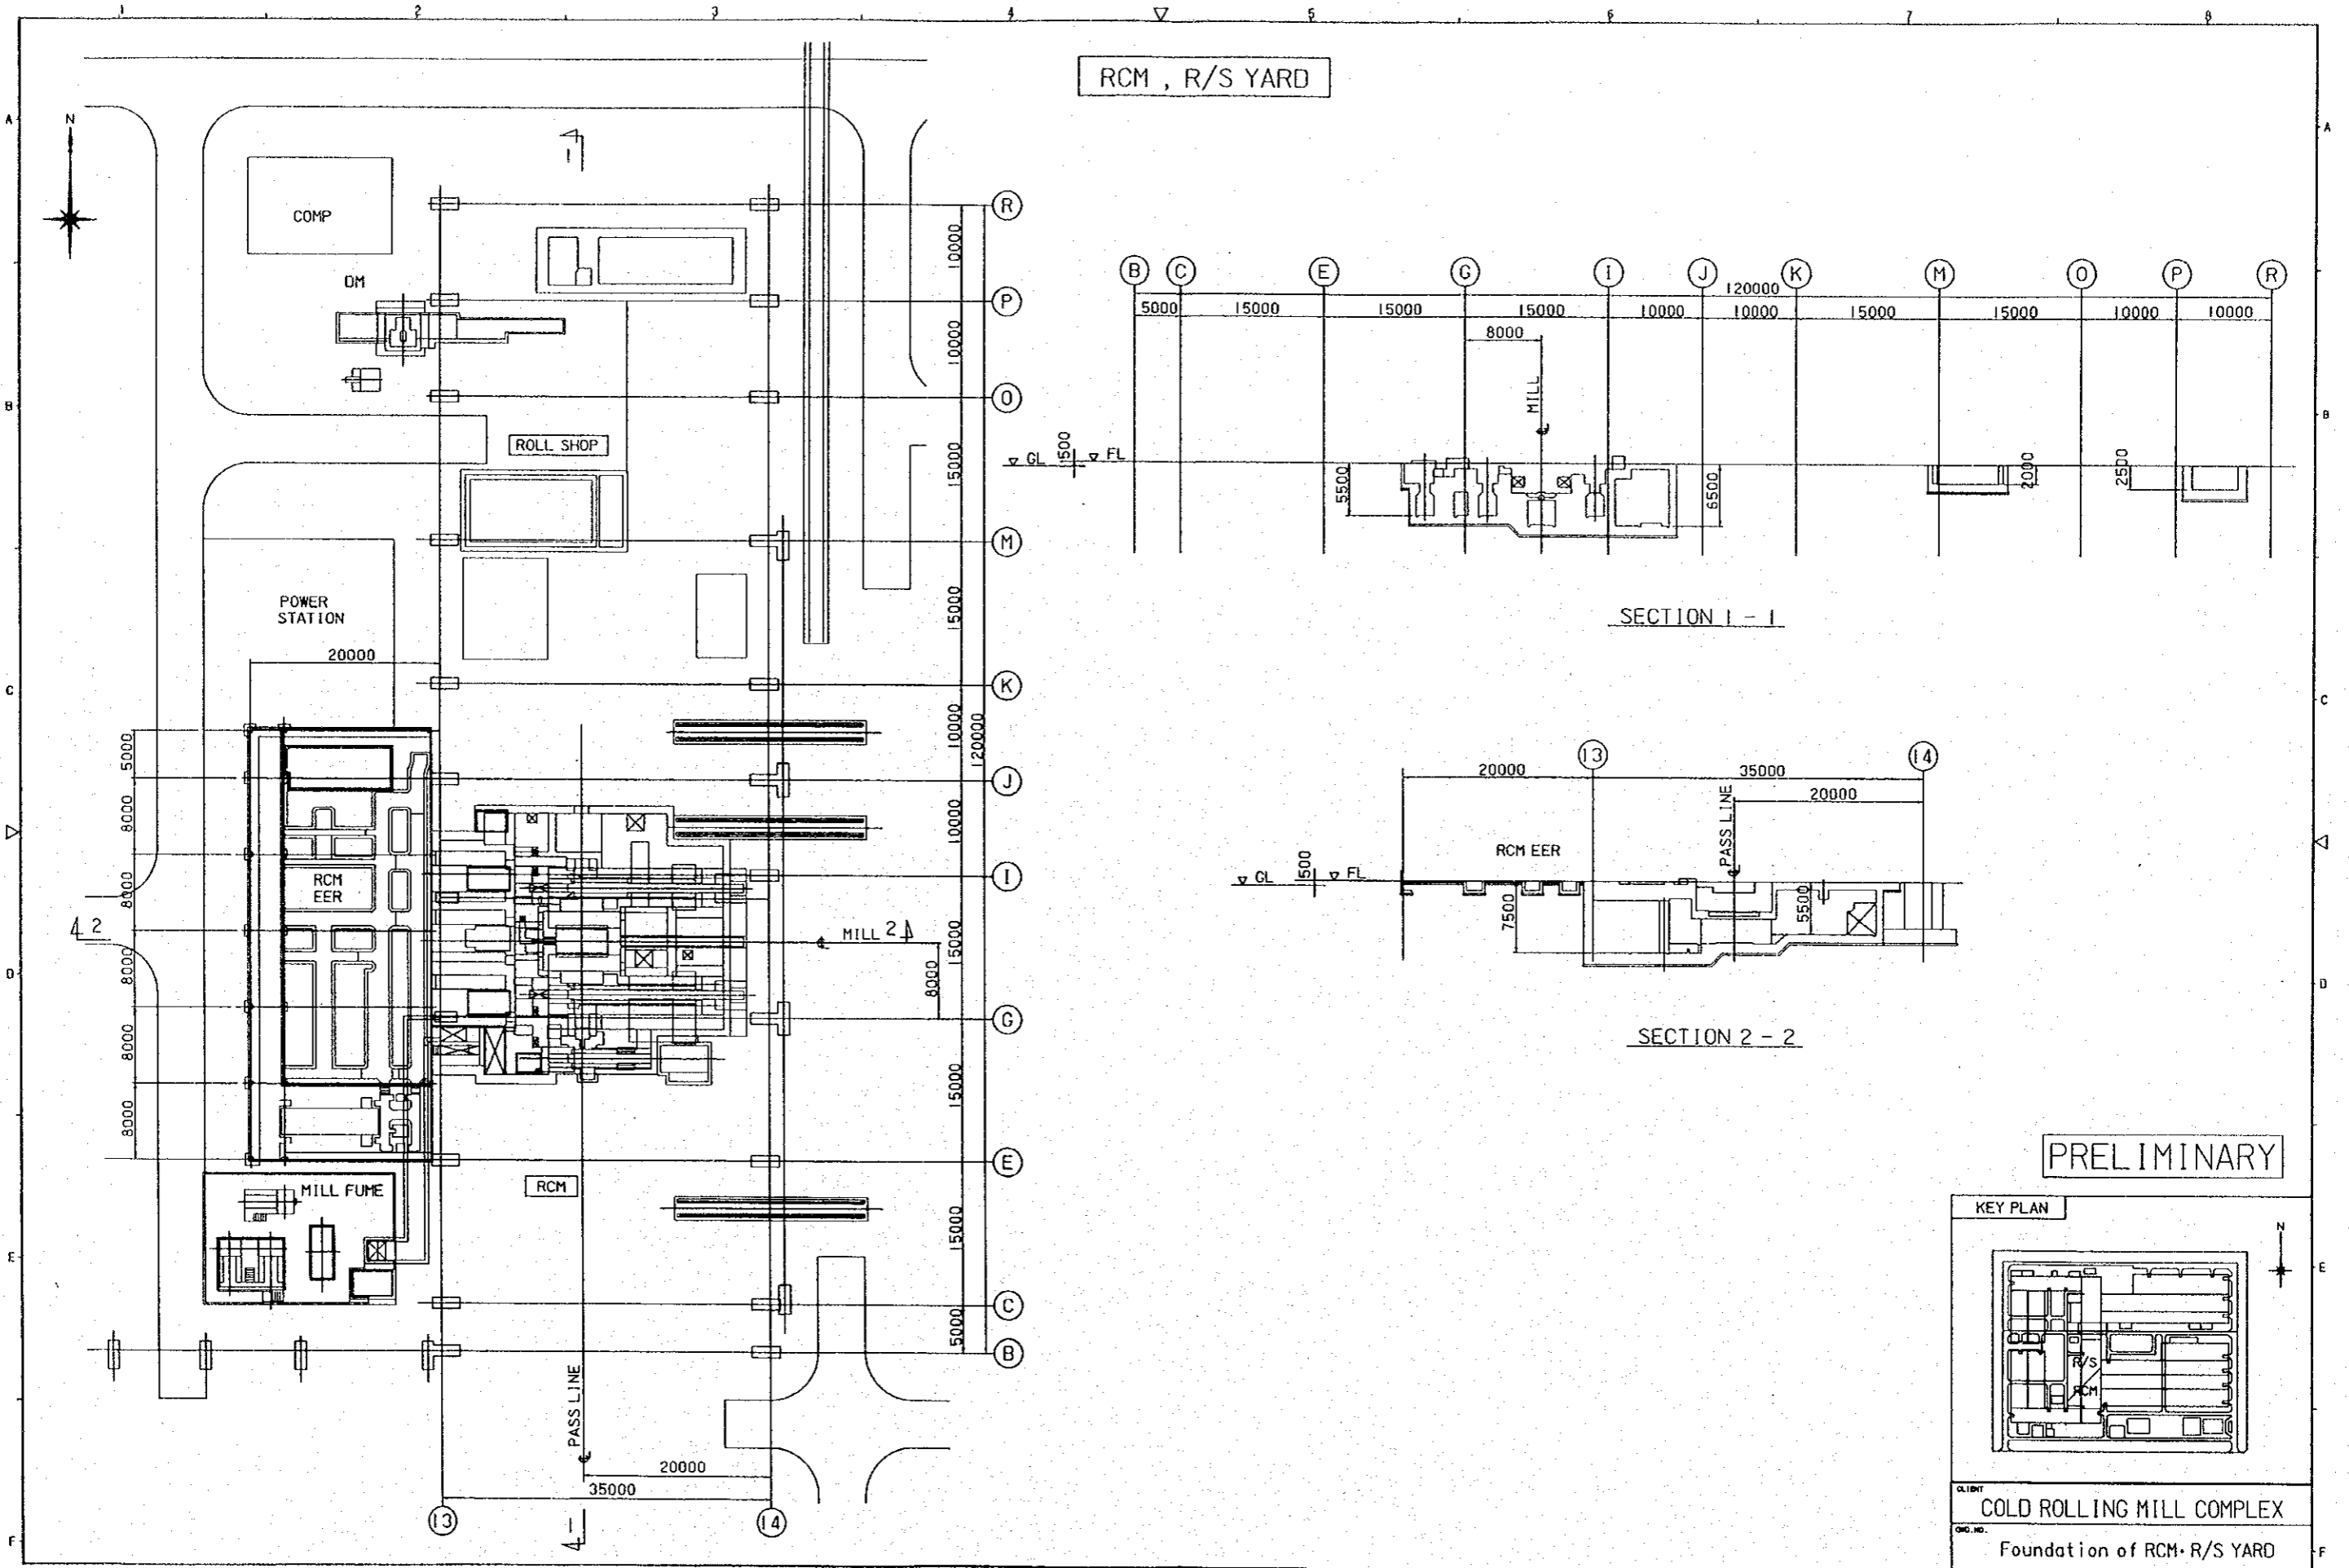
Foundation Plan of RCM R/S YARD
